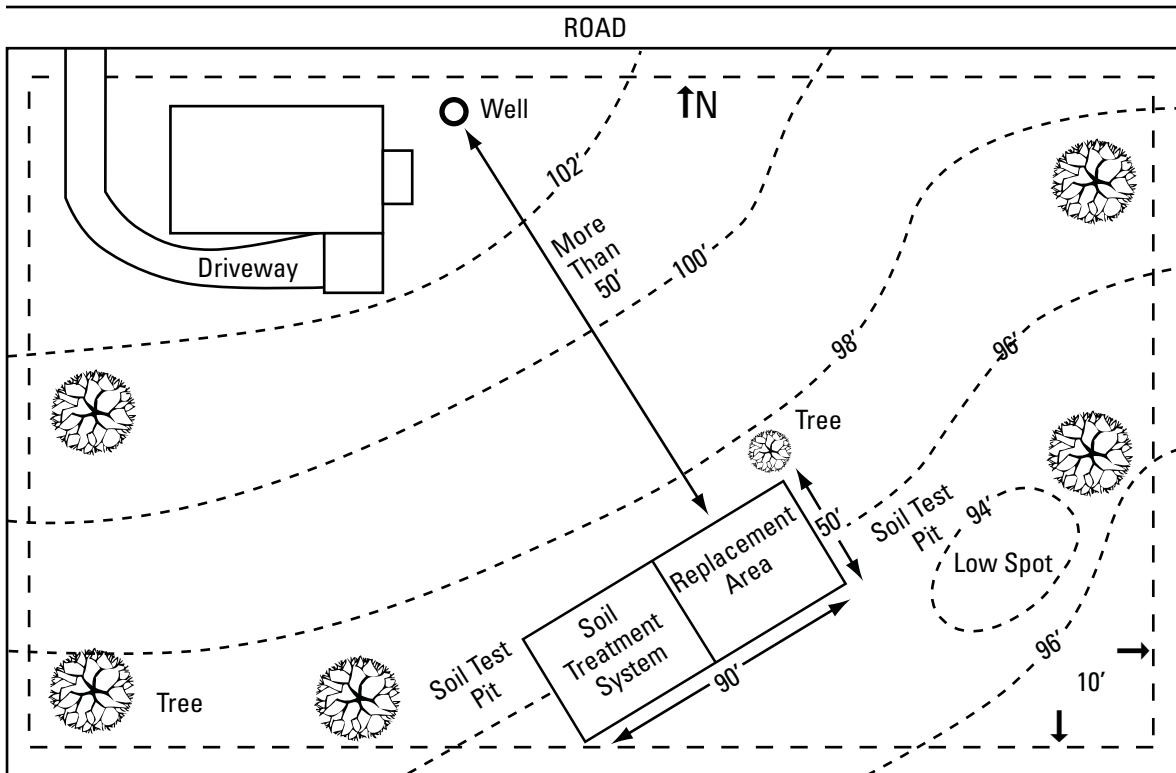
Draft of layout plan with site of proposed soil treatment system.
